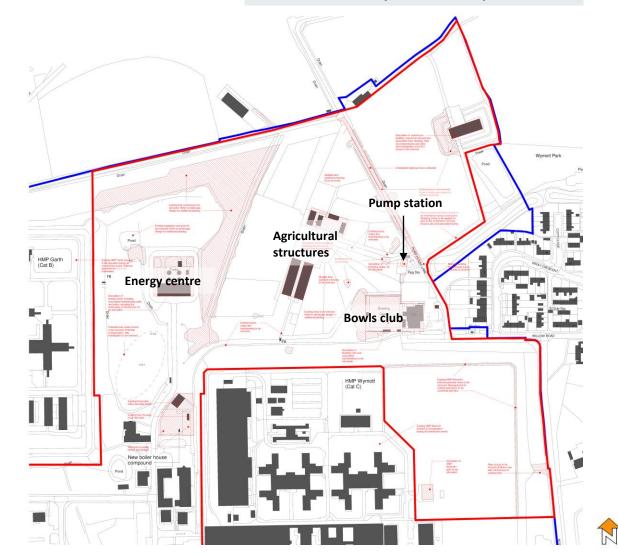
Demolition Site Plan (full plan submitted with OPA)– Garth Wymott 2
